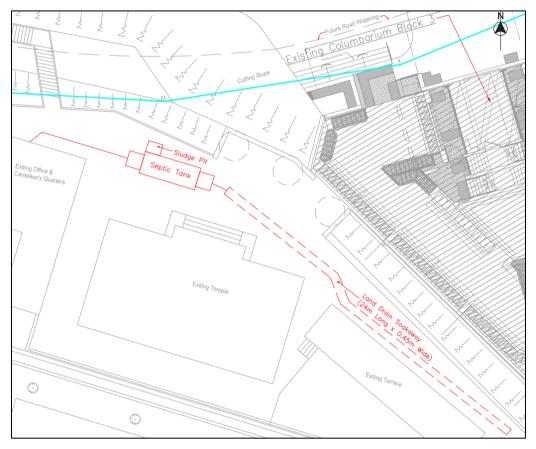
Layout Plan of Existing Septic Tank and Soakaway System
